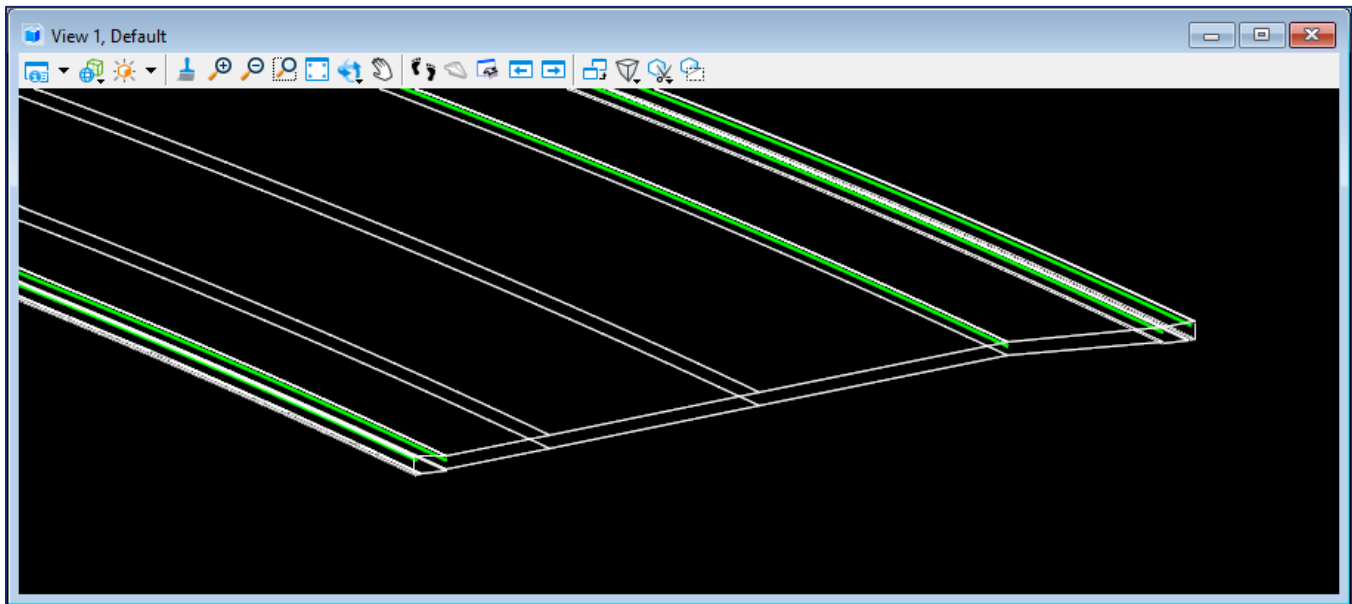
White – Bridge Deck Geometry, Green – 5 Distribution Guidelines
